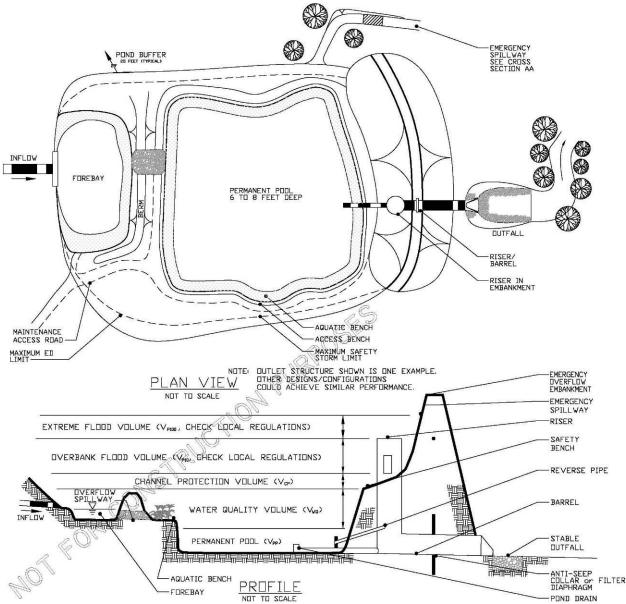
Design recommendations for stormwater ponds (plan and profile).
